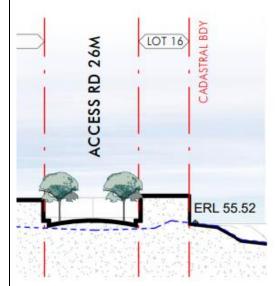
Excerpt from Architectural plans - Section 1 Mamre Road
